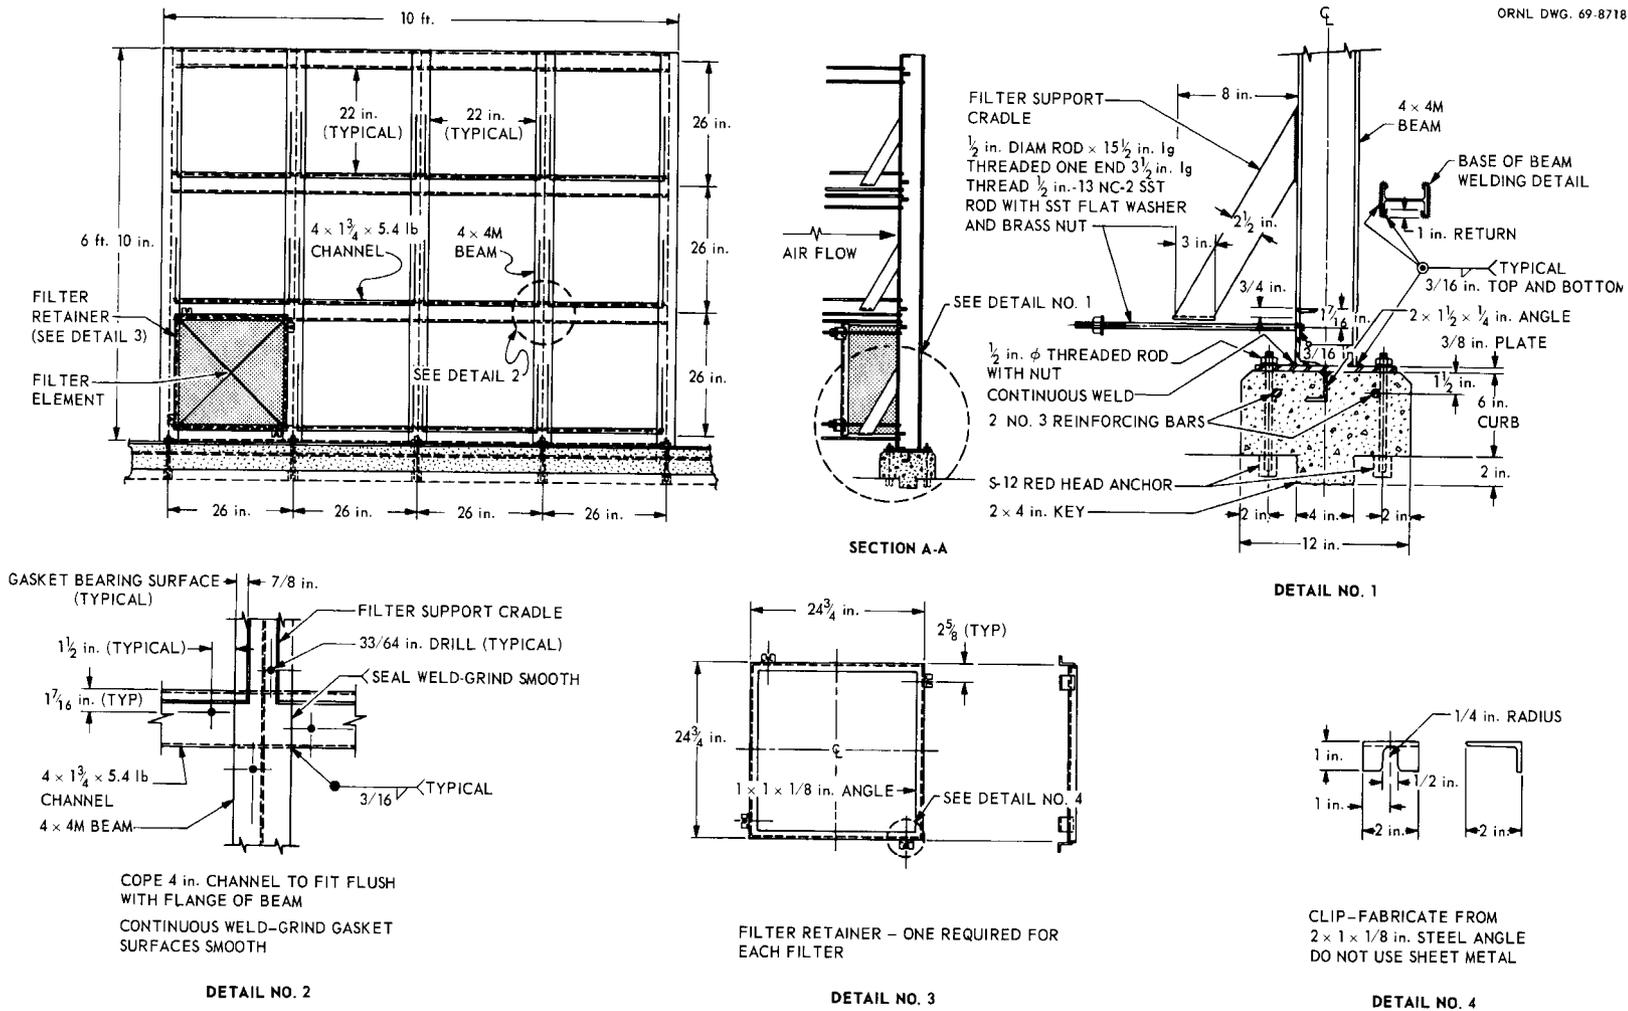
Design details for structural steel HEPA filter and adsorber mounting frame. Courtesy Oak Ridge National Laboratory.
